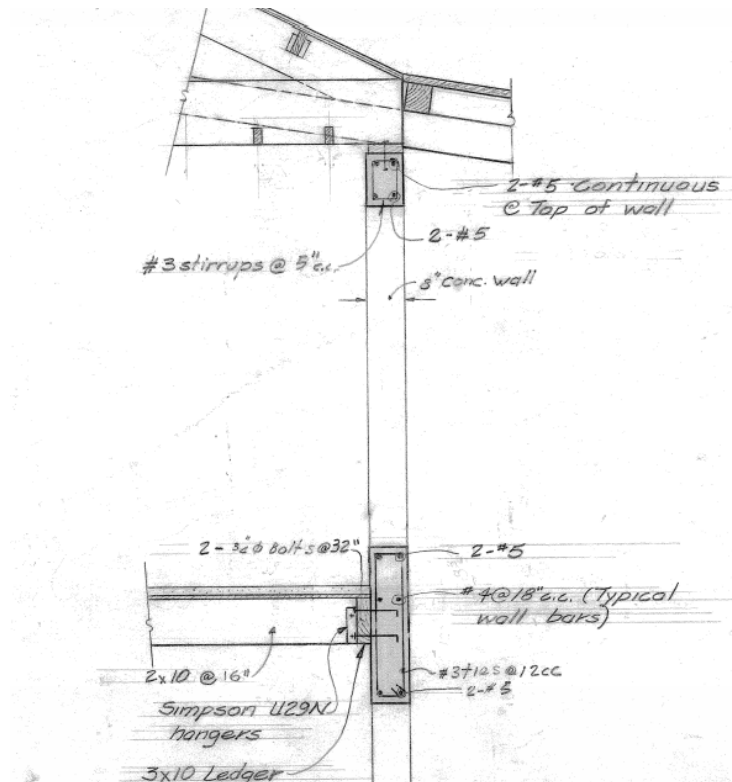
Detail 1/S14 - Diaphragm to Wall Connection
